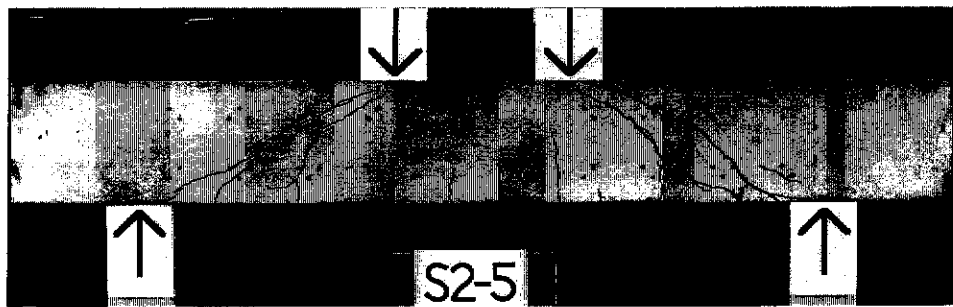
Crack Pattern of the Front Face of Beam S2-5
